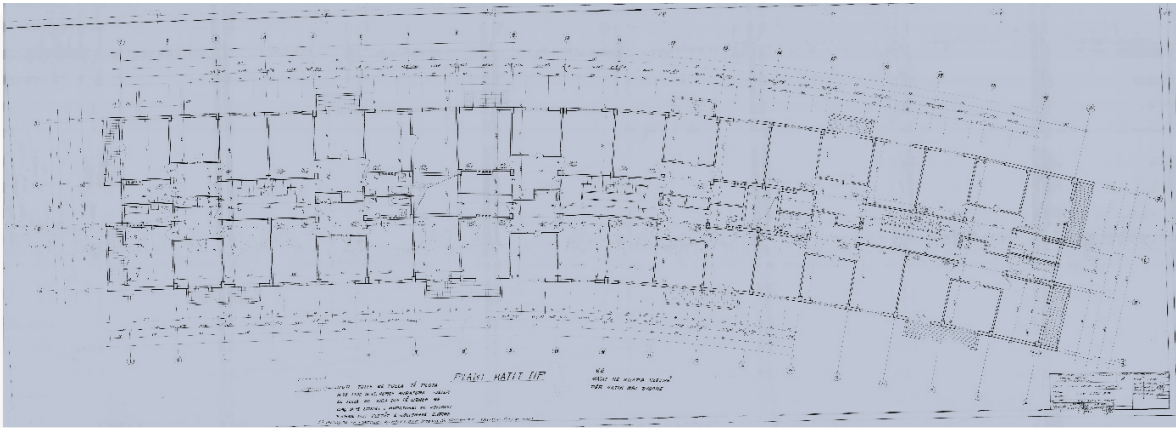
Typical Floor Plan of One of the Apartment Blocks of Residential Complex by Petraq Kolevica (AQTN).
